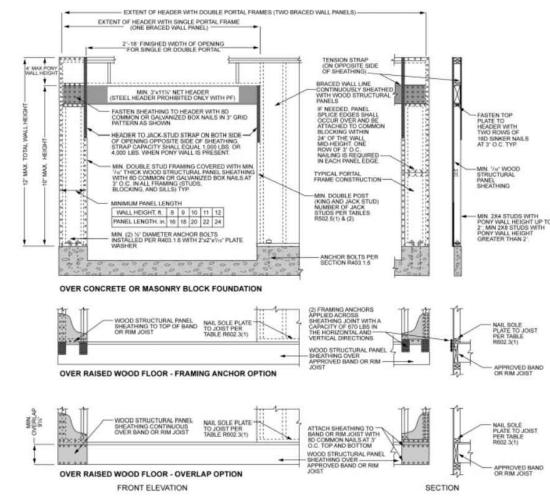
METHOD PF—PORTAL FRAME CONSTRUCTION
